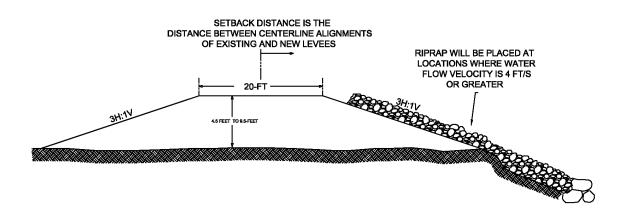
Top: Typical section of levee to be improved in place by geometry modification. This Section is representative of areas where a setback levee transitions into an existing levee alignment and /or where space limitations are not a concern.
